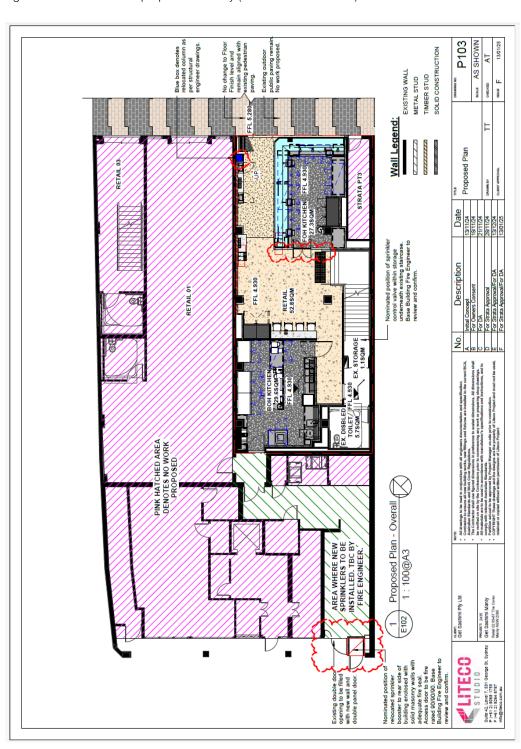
Ground floor of proposed tenancy (Source: LiteCo Studio)
